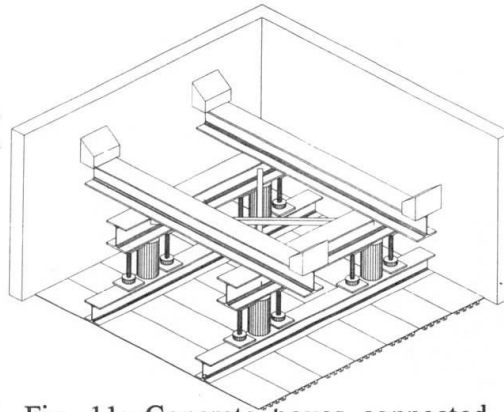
Concrete boxes connected to the walls to reduce the pressure on the soil
